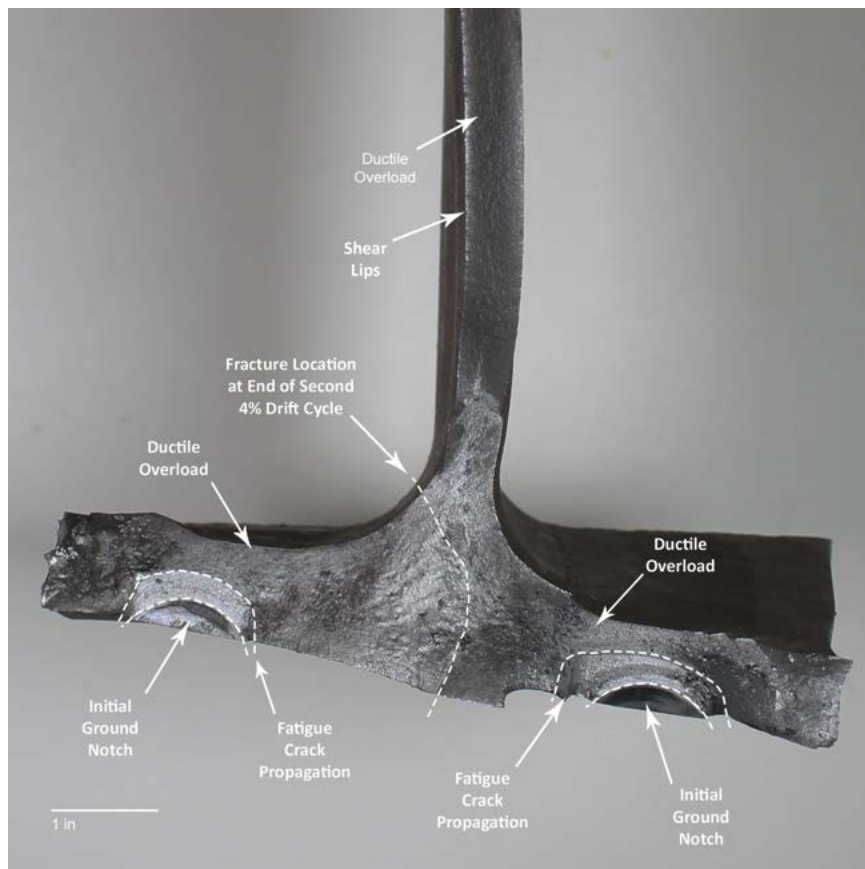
W36RBS-0.25N-T94 bottom flange fracture looking towards the end-plate.
